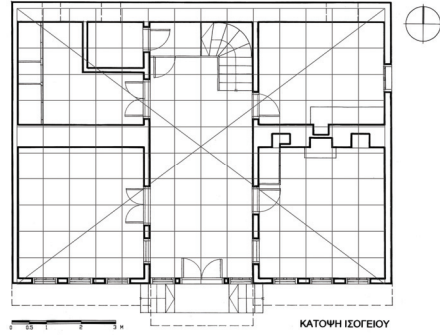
Ground floor plan of Chatzitzotzas Mansion in Florina
